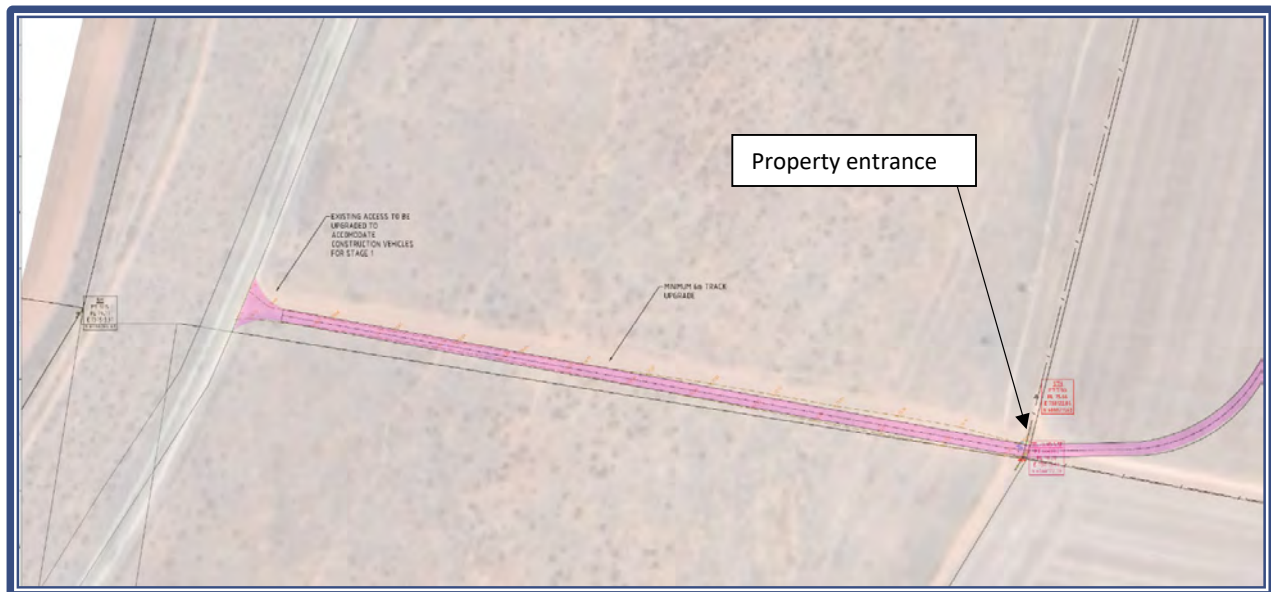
Plan identifying the project site access (Source: Price Merrett – Sheet 12)
